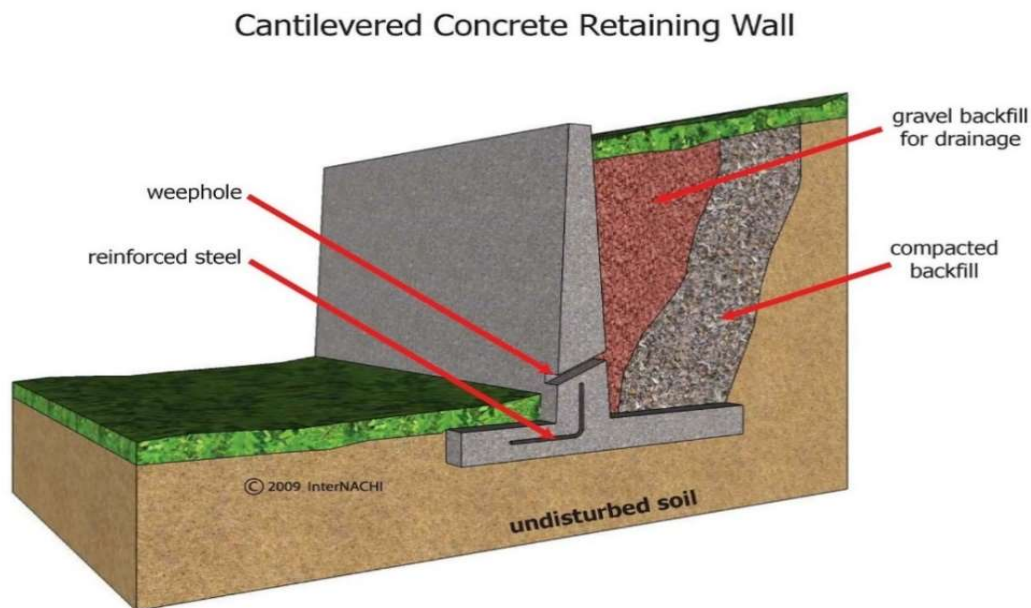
Cantilevered concrete retaining wall (InterNACHI.com 2009)
